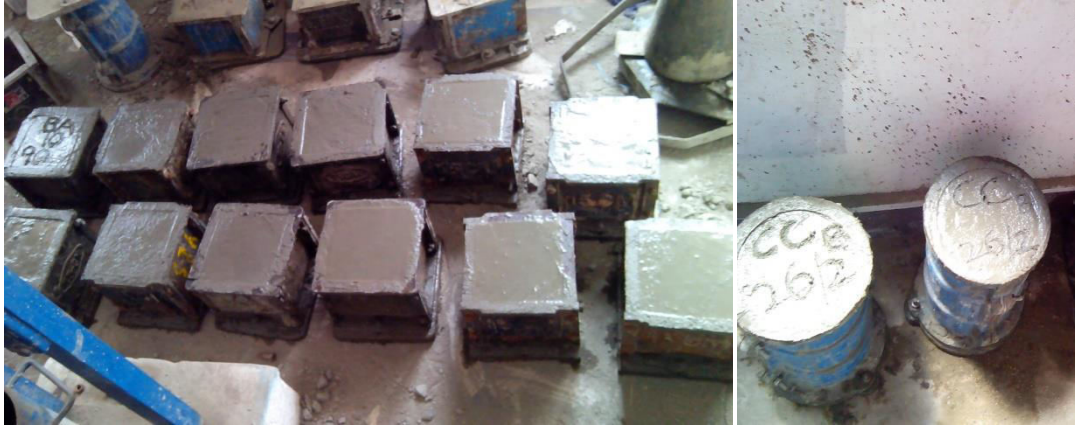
Sampling of concrete above figure shows casting of concrete cubes, cylinders and prisms.
